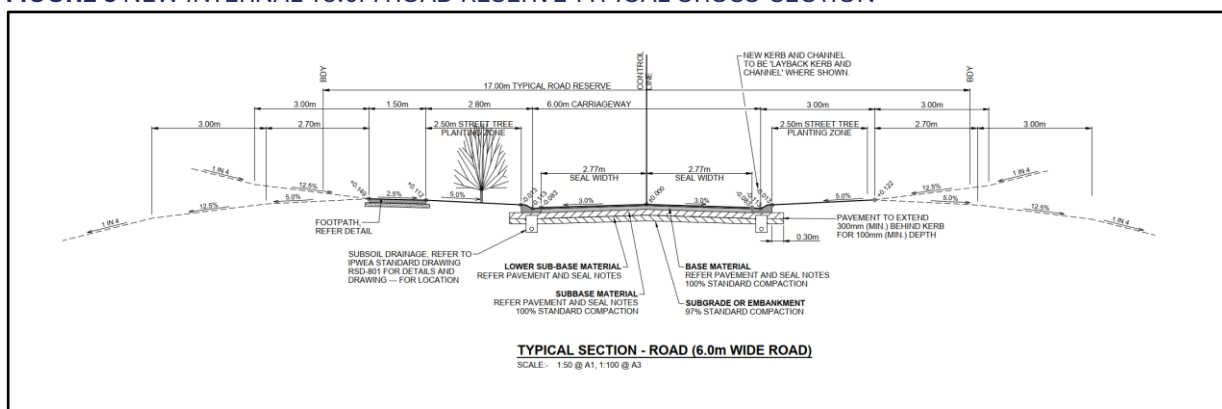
NEW CUL-DE-SAC 17.0M ROAD RESERVE TYPICAL CROSS-SECTION
